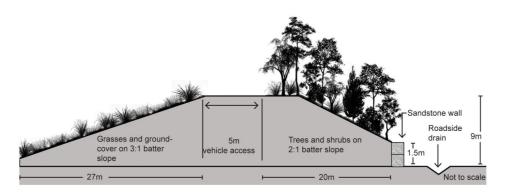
Typical section of bund wall for visual screening on ML50218, adjacent to Seventeen Mile Road.
